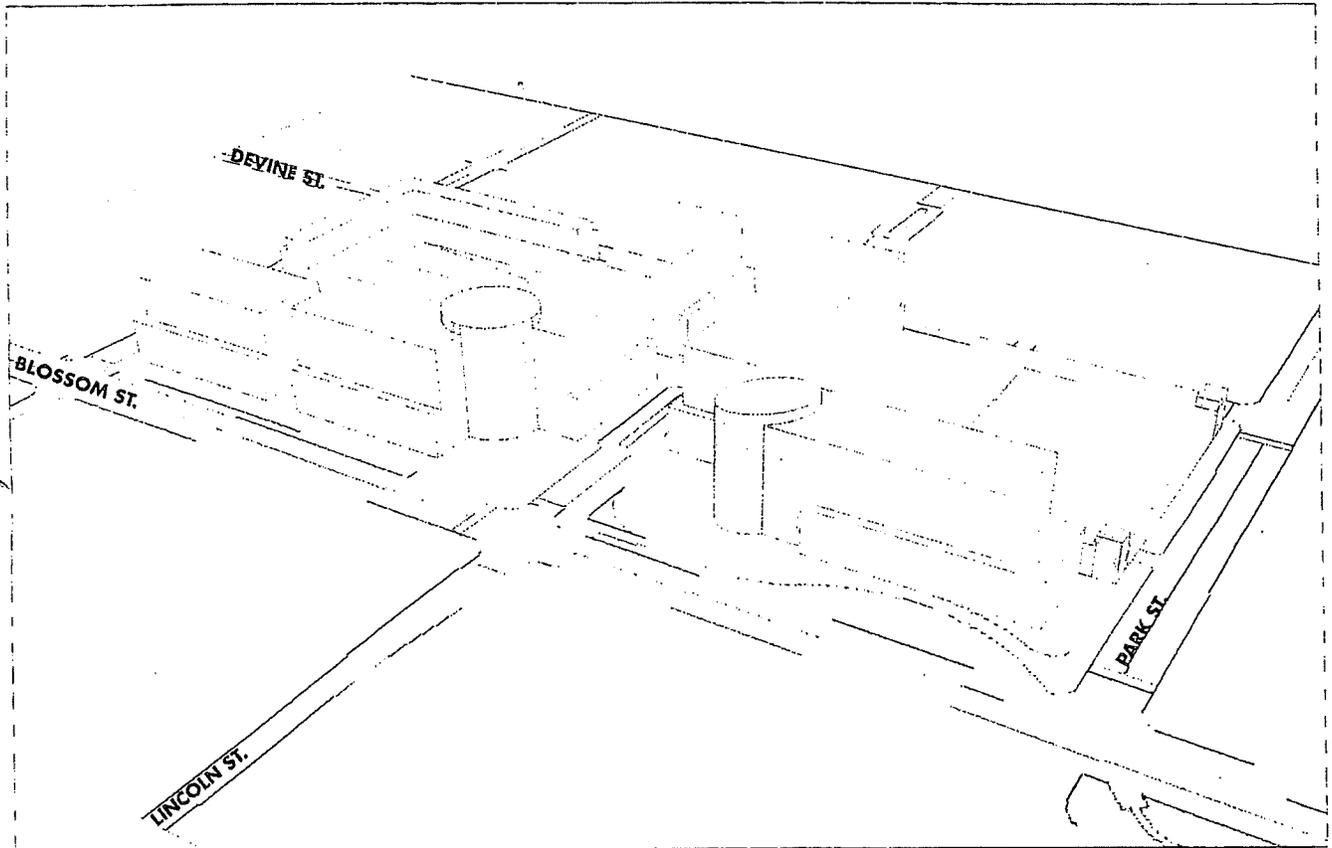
LINCOLN STREET GATEWAY BUILDING MASSING ILLUSTRATIVE
